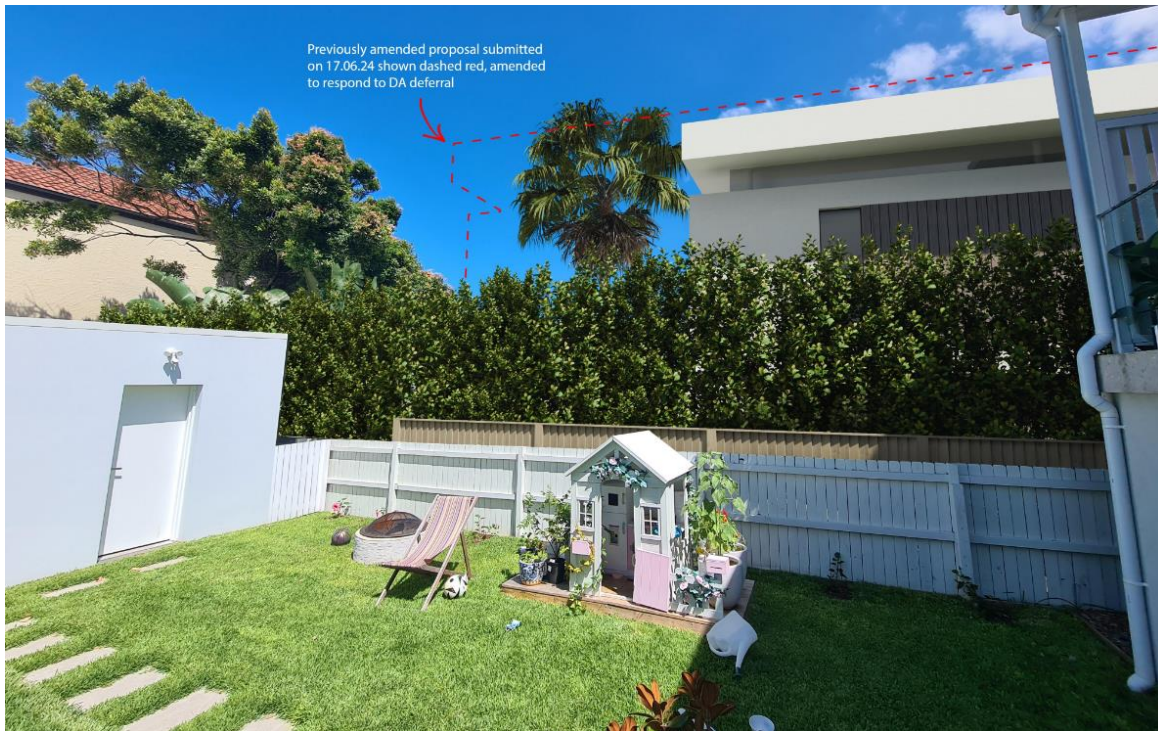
View from rear garden of 1 Bona Vista Avenue - Render demonstrating how the proposal will look with mature landscaping (Source: Applicant)
